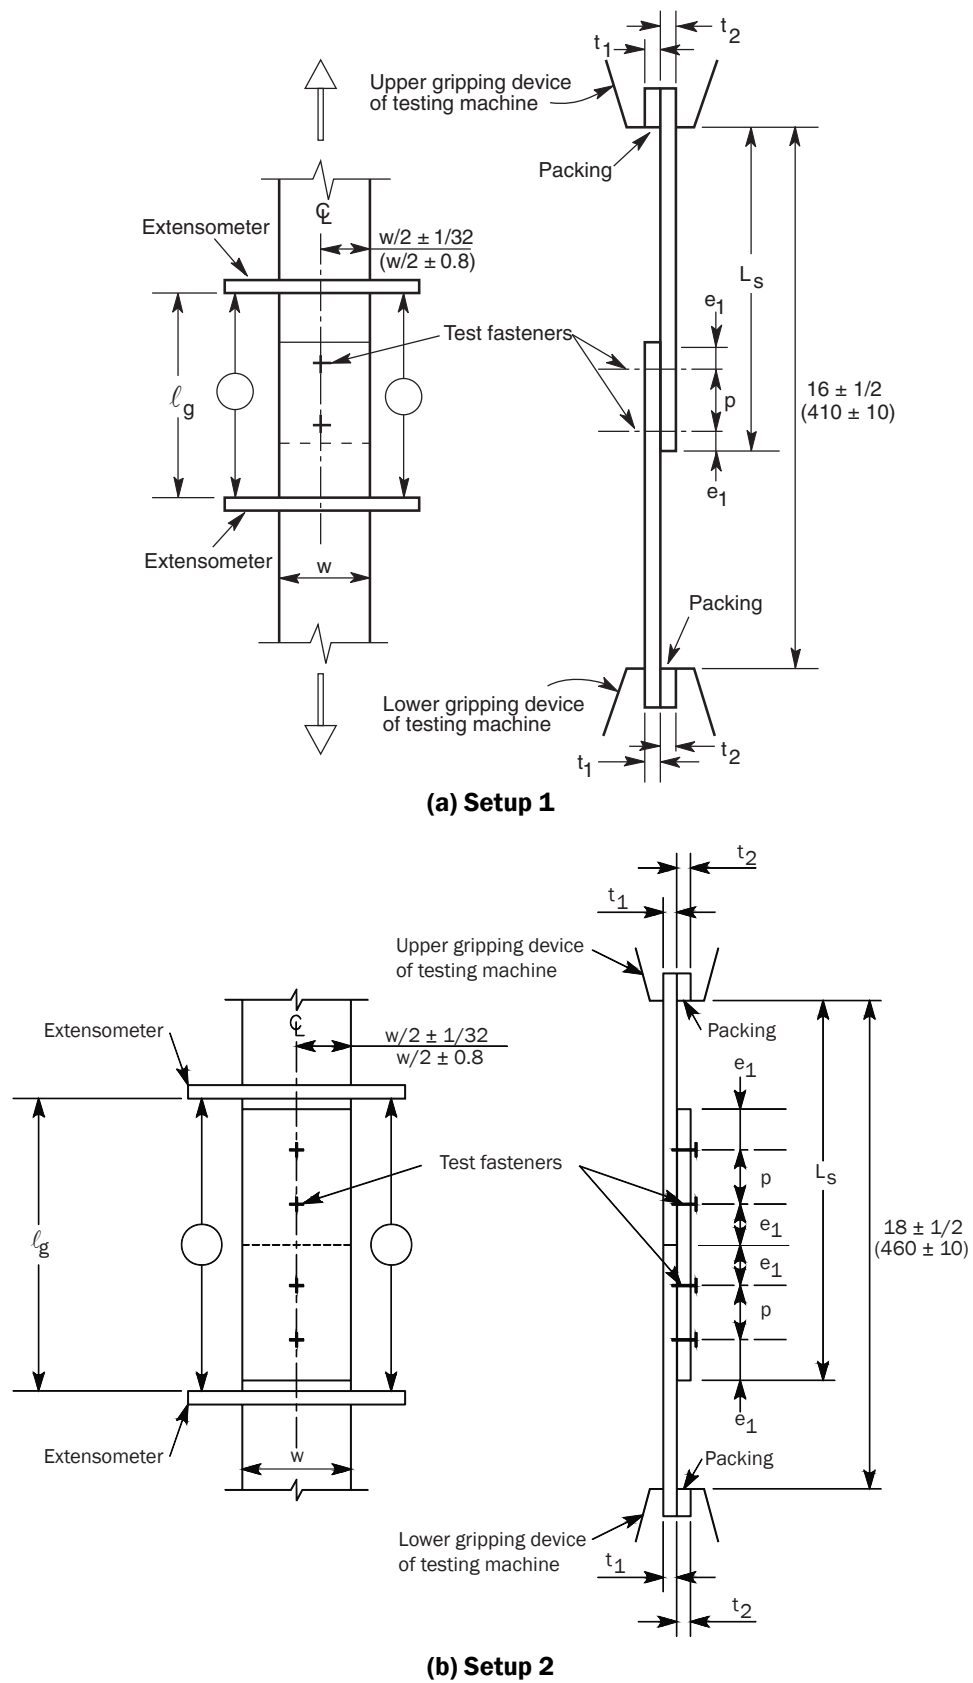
Standard Lap-Joint Shear Test, units - in. (mm)
